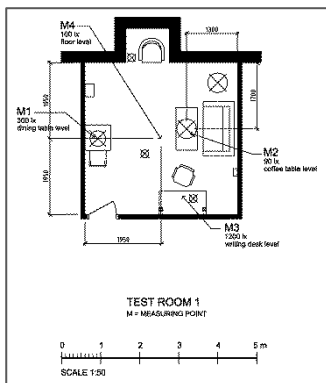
St.3. R 1 Floor plan (see appendix B). Fig. 24. St. 3. R 2 Floor plan (see appendix B).
